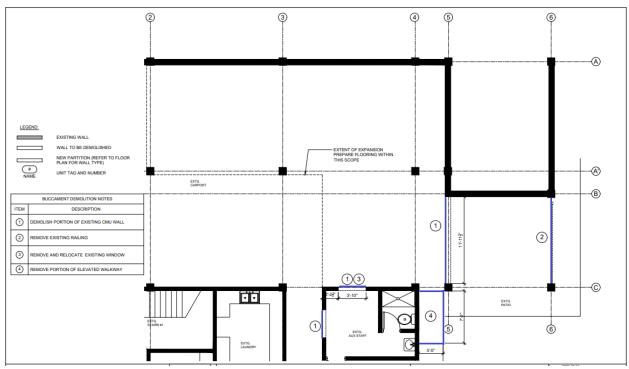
Demolition Floor Plan for the Isolation Facility at the Buccament Polyclinic
